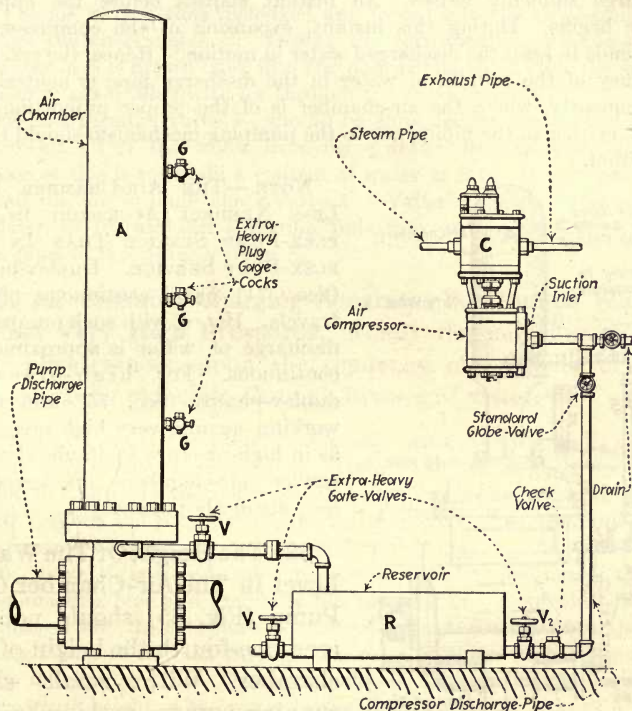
Apparatus For Replenishing Air-Chamber In Discharge-Pipe Of Hydraulic Elevator Pump Under 800 Lb. Pressure Per Sq. In.
